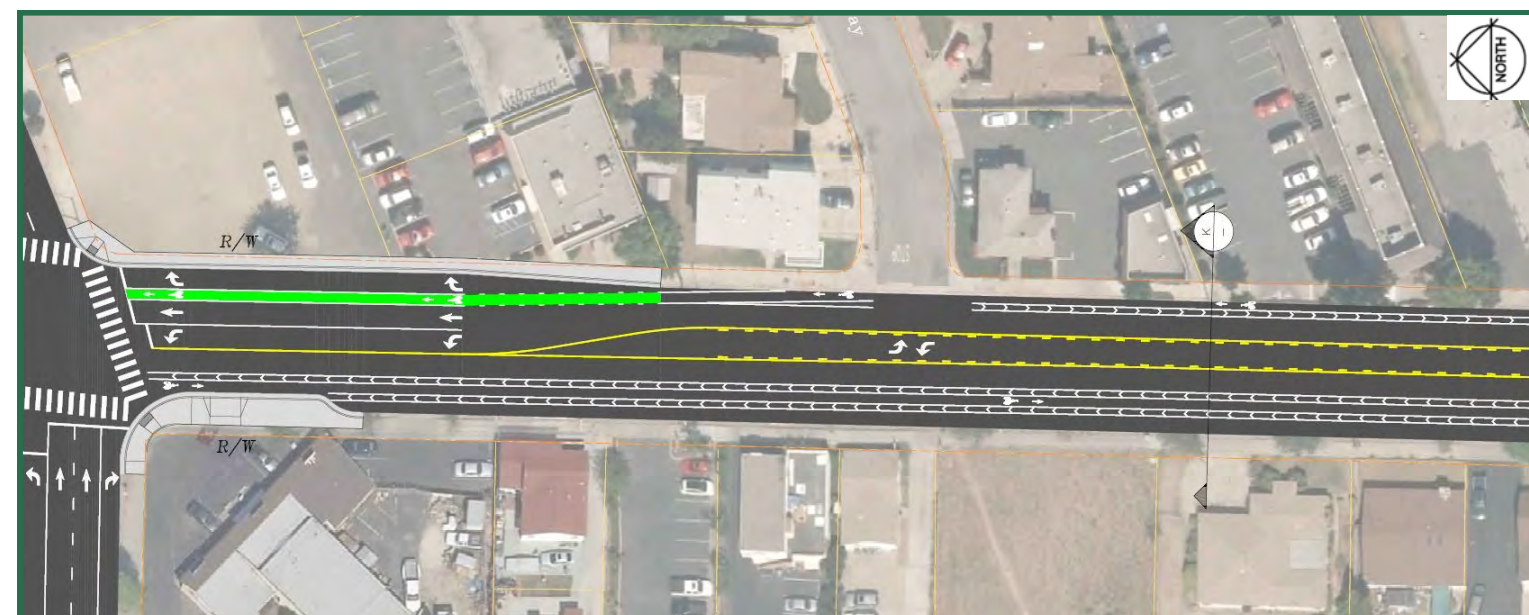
Context Zone 2: Recommended Complete Streets Plan & Cross-Sections
